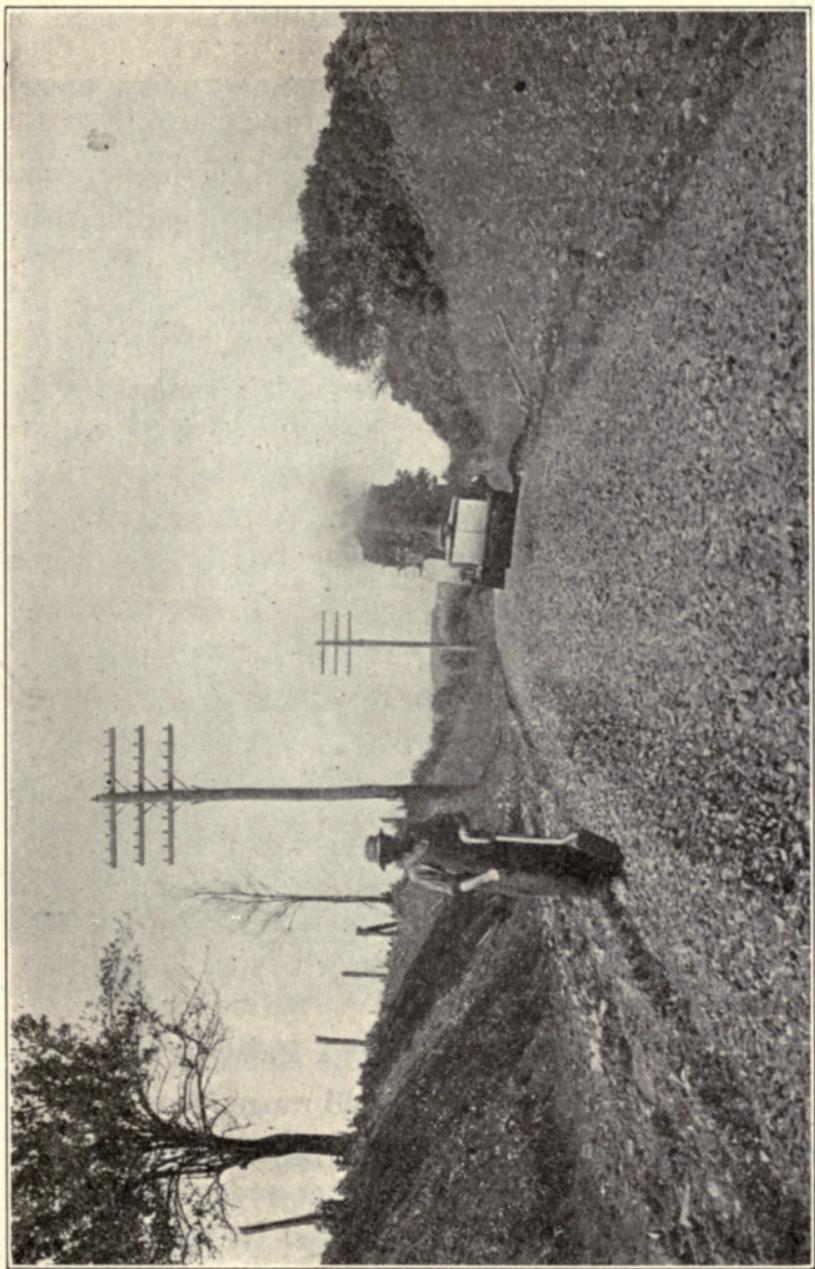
Rolling the foundation course of stone for a macadam road.
